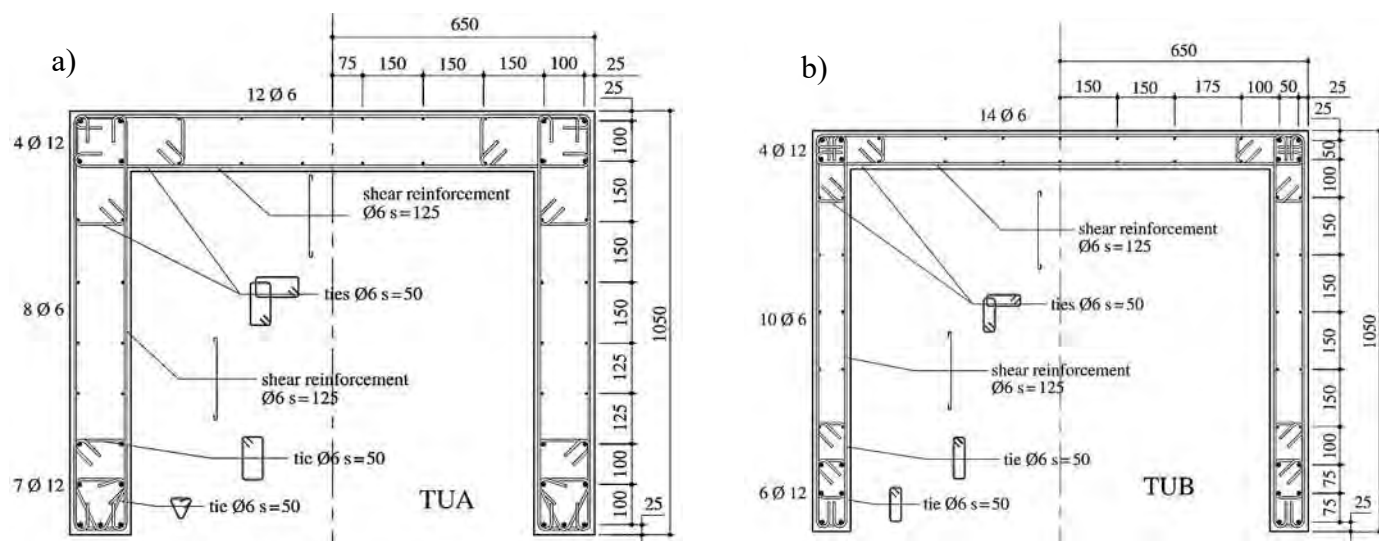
Cross-sections of specimens (a) TUA and (b) TUB (Beyer *et al.*, 2008)
